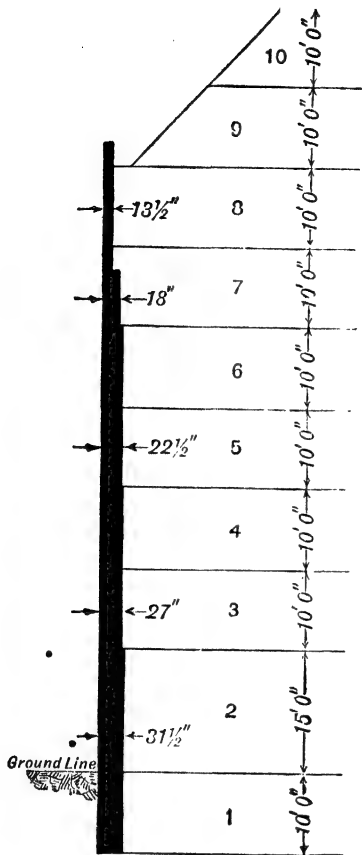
Self-supporting Brick Wall for a Building of the Warehouse Class.
